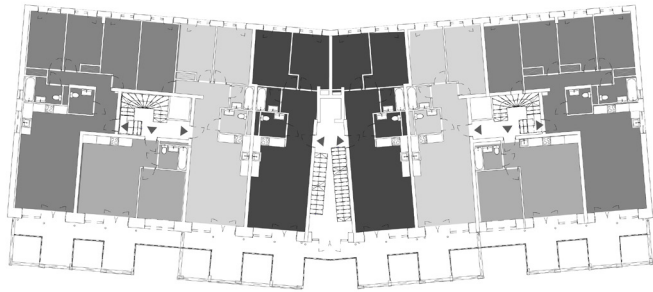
Apartments, Typical Floor - Soubeyran / Geneva
